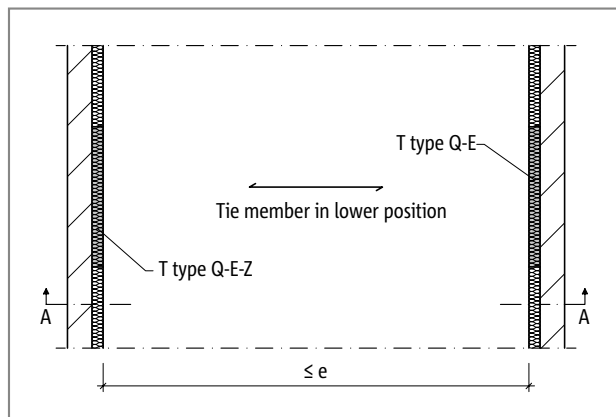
Schöck Isokorb® T type Q-E, Q-E-Z: Reinforced concrete slab tensioned in a single axis
